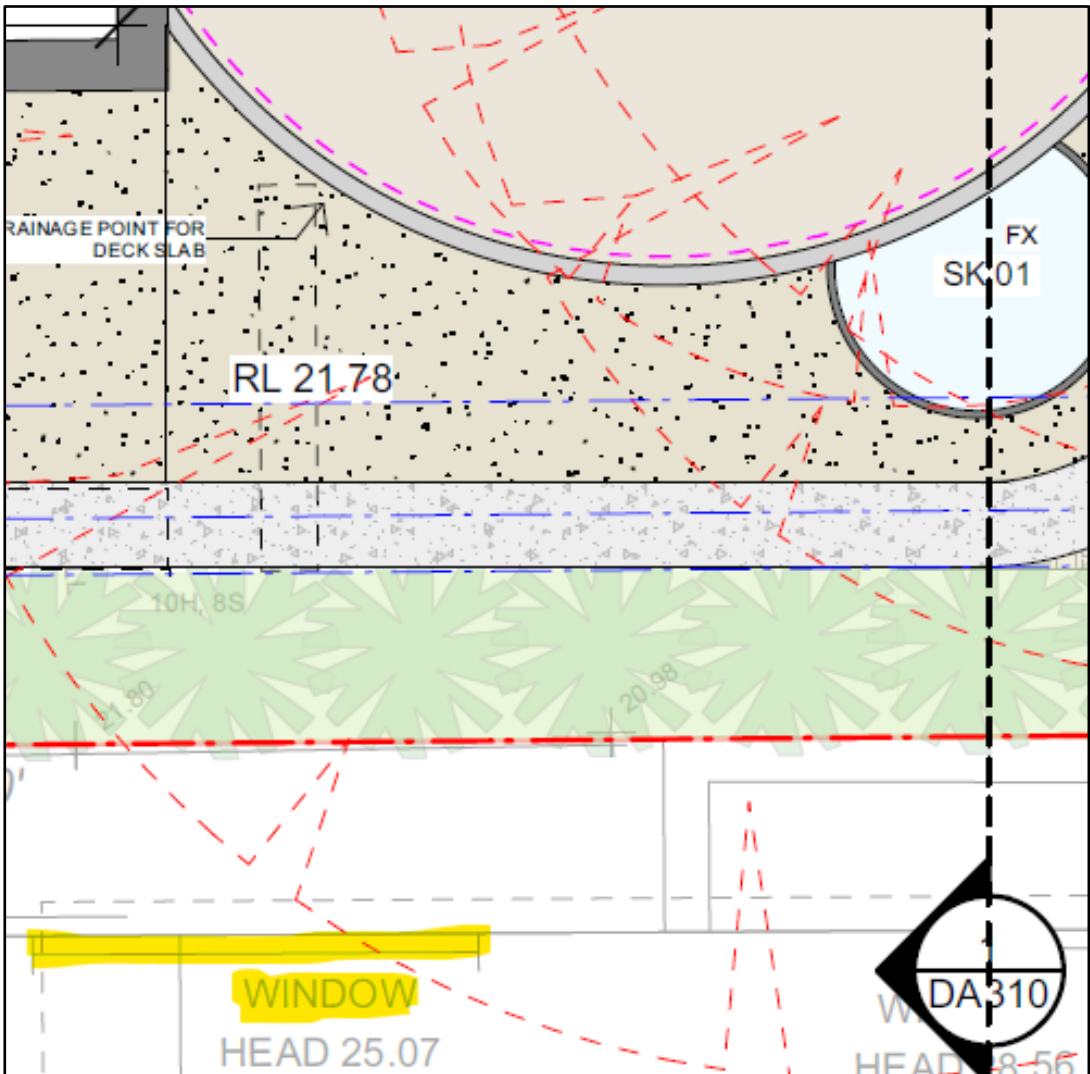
extract of ground floor plan with neighbouring ground floor window highlighted.
